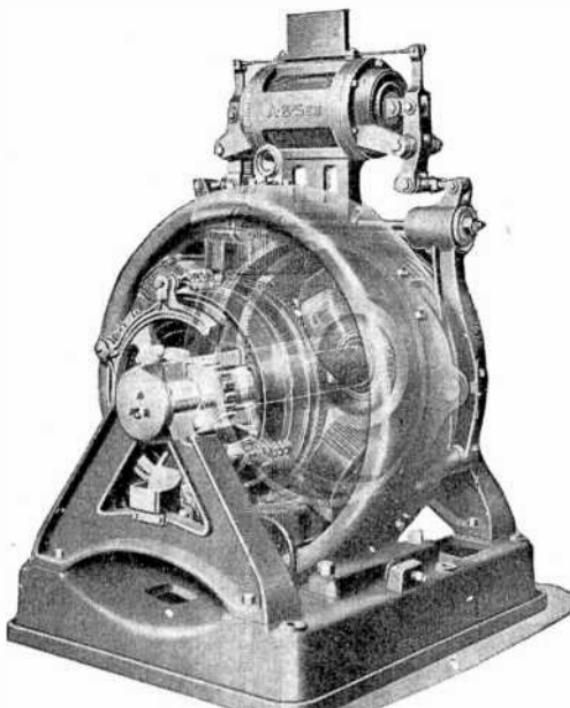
,761.—A. B. See gearless half wrap (V groove) traction elevator machine. It is built in sizes suitable for loads of 1,500 to 3,500 lbs. with one to one roping and speeds varying from 450 ft. per min. to the highest allowed under state and municipal regulations. The shaft does not revolve, being fastened to the pedestals. The duty of this shaft is solely to carry the load imposed upon it by the revolving parts of the machine and the weight of the moving parts in the hoistway. The brake consists of two independently operated shoes, provided with fabric linings. The pressure of the shoes on the brake drum is obtained by adjustable compression springs, and is released electro-magnetically on the application of current to the motor, in such a manner that should this current be interrupted from any cause the brake will be immediately applied and bring the car to rest. Means are provided to regulate the application of the brake so that it brings the car to a smooth stop. The various parts comprising the brake are all mounted directly on the field frame of the motor.
